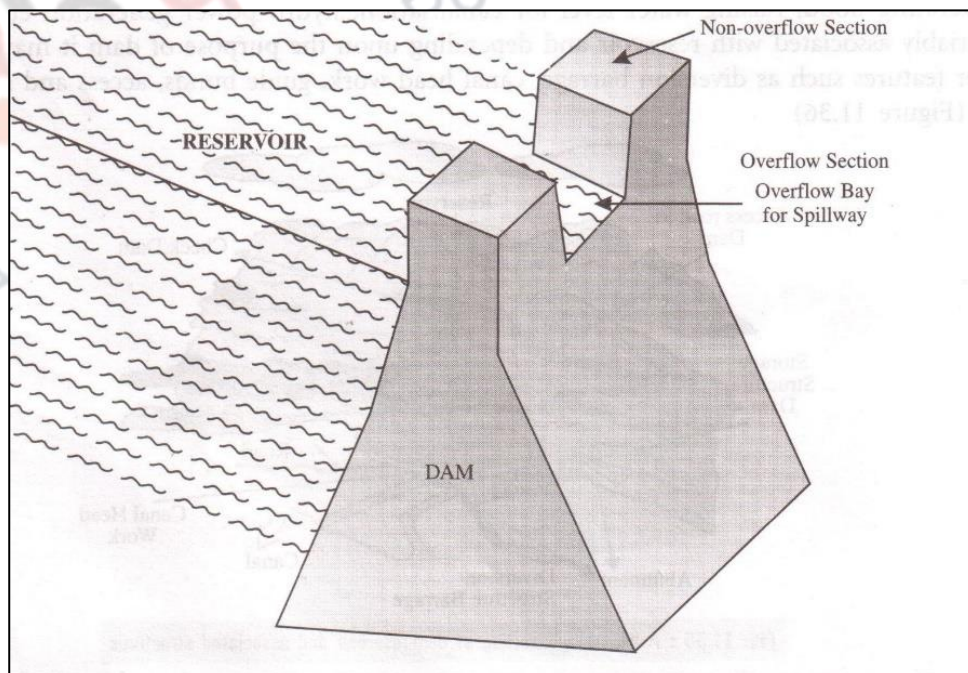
The typical trapezoidal cross section of a gravity dam.
